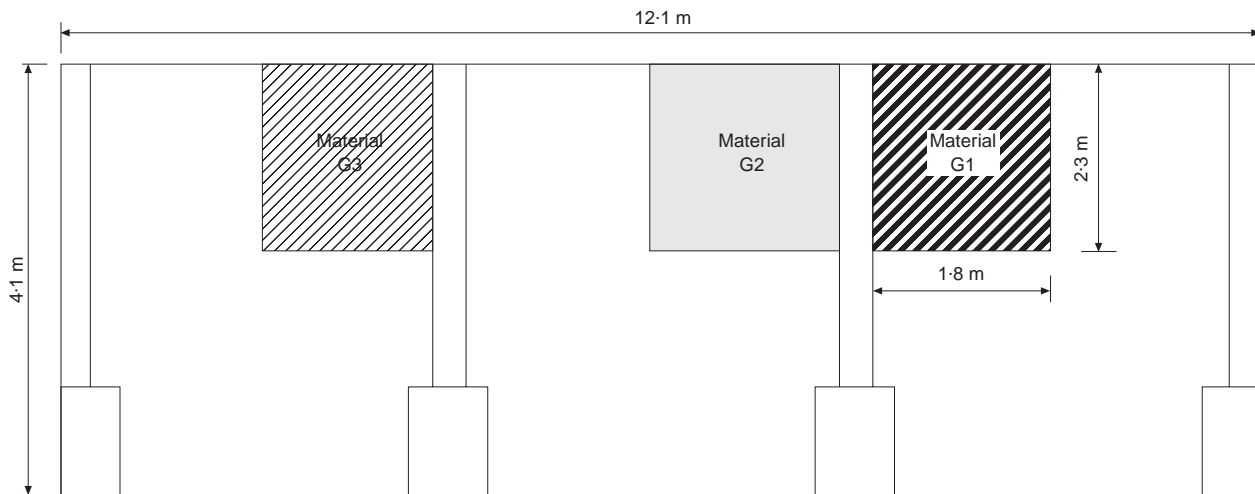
Location of repair patches at Gunthorpe Bridge (south abutment) (not to scale)
